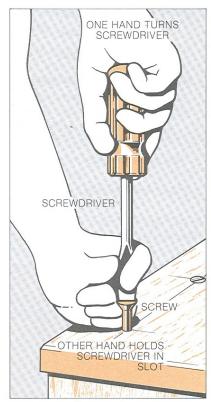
Proper way to hold  $\alpha$  screwdriver. The right hand turns the screwdriver while the left hand holds it in position.
